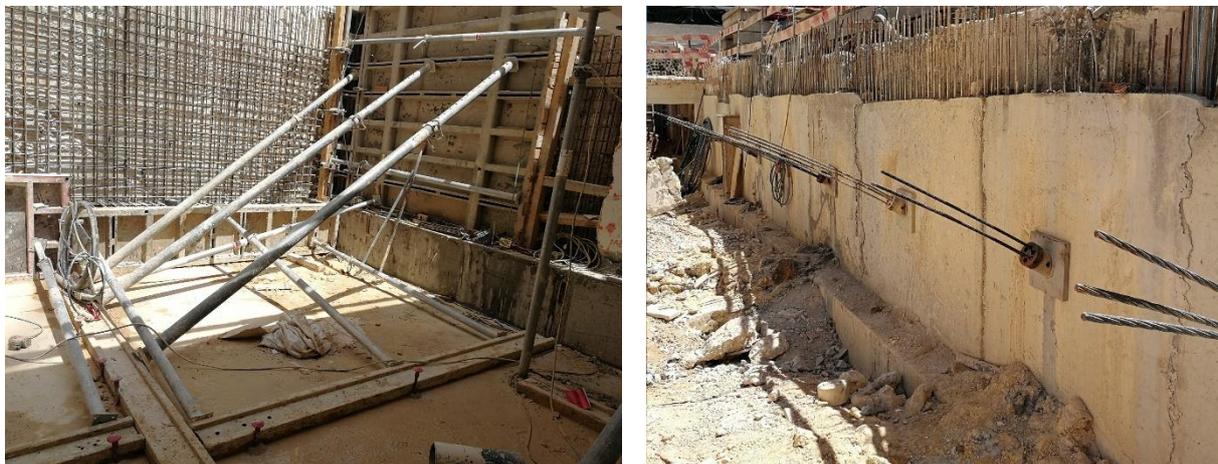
Execution of the formwork of one king post wall panel (on the left). Executed temporary ground anchors (on the right).
